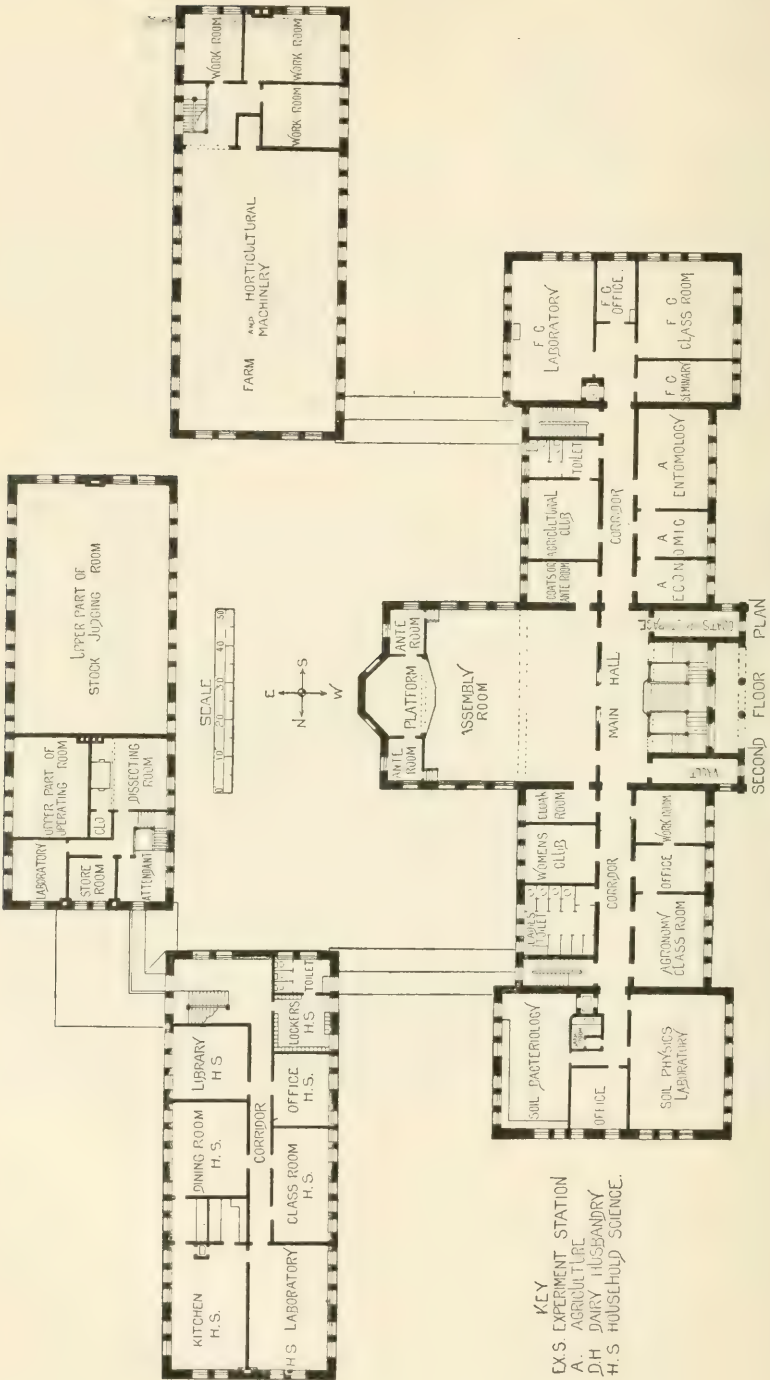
Second-floor plan, Illinois Agricultural Building.
